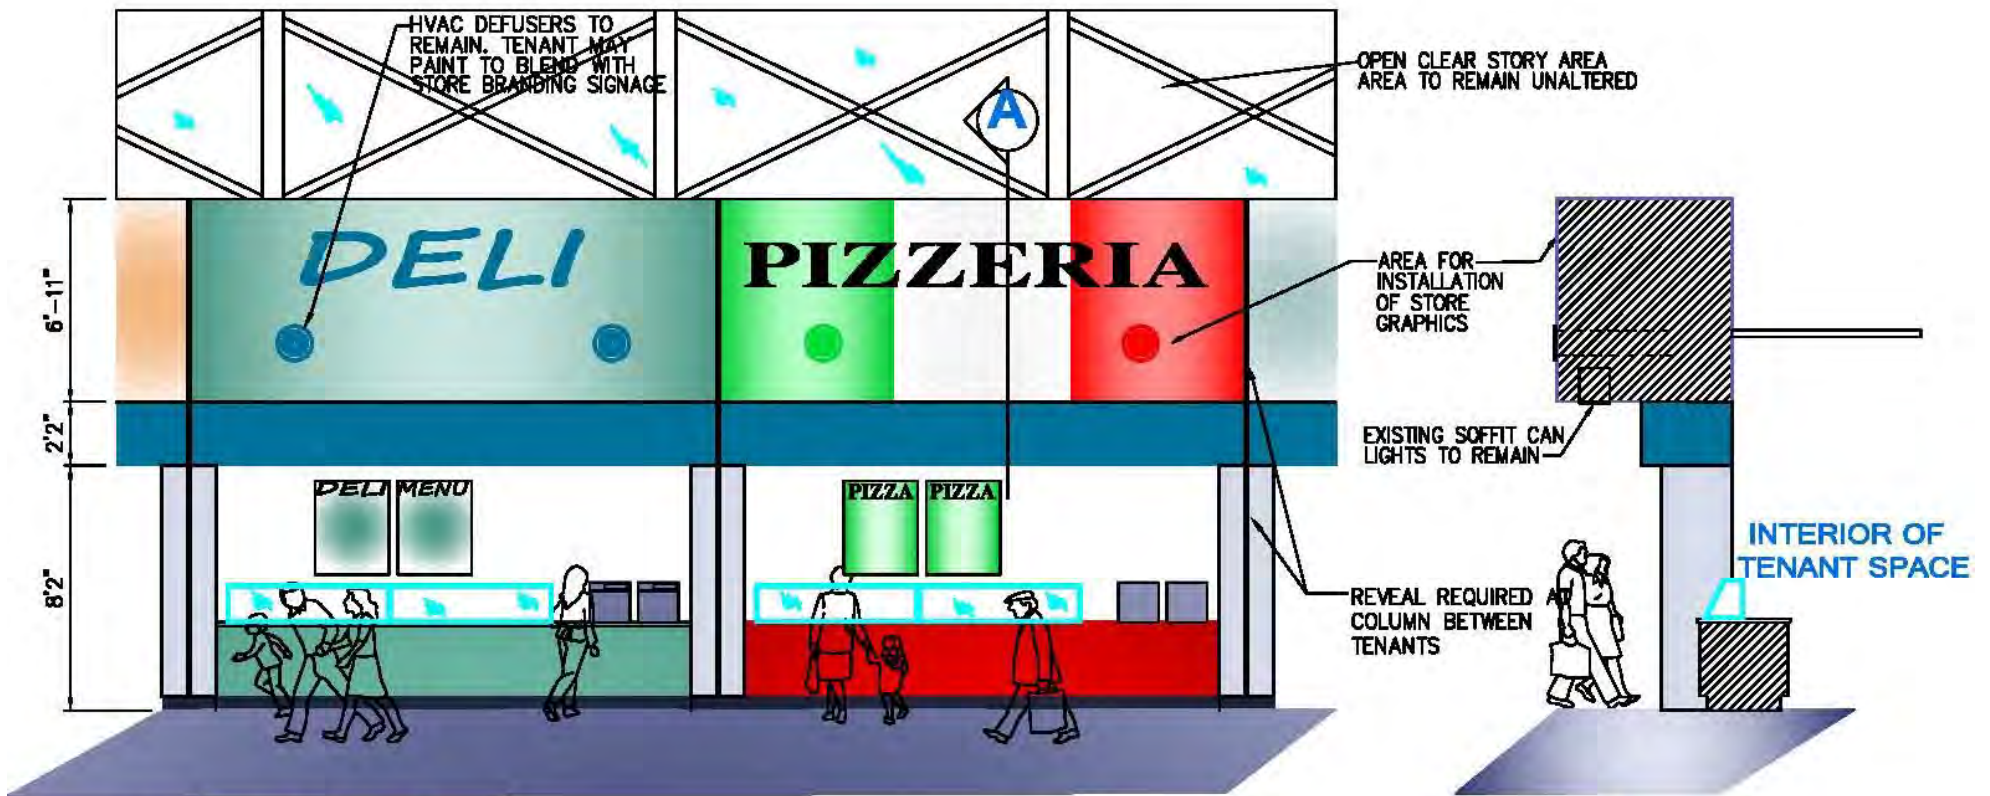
CONCOURSE B FOOD COURT ELEVATION
